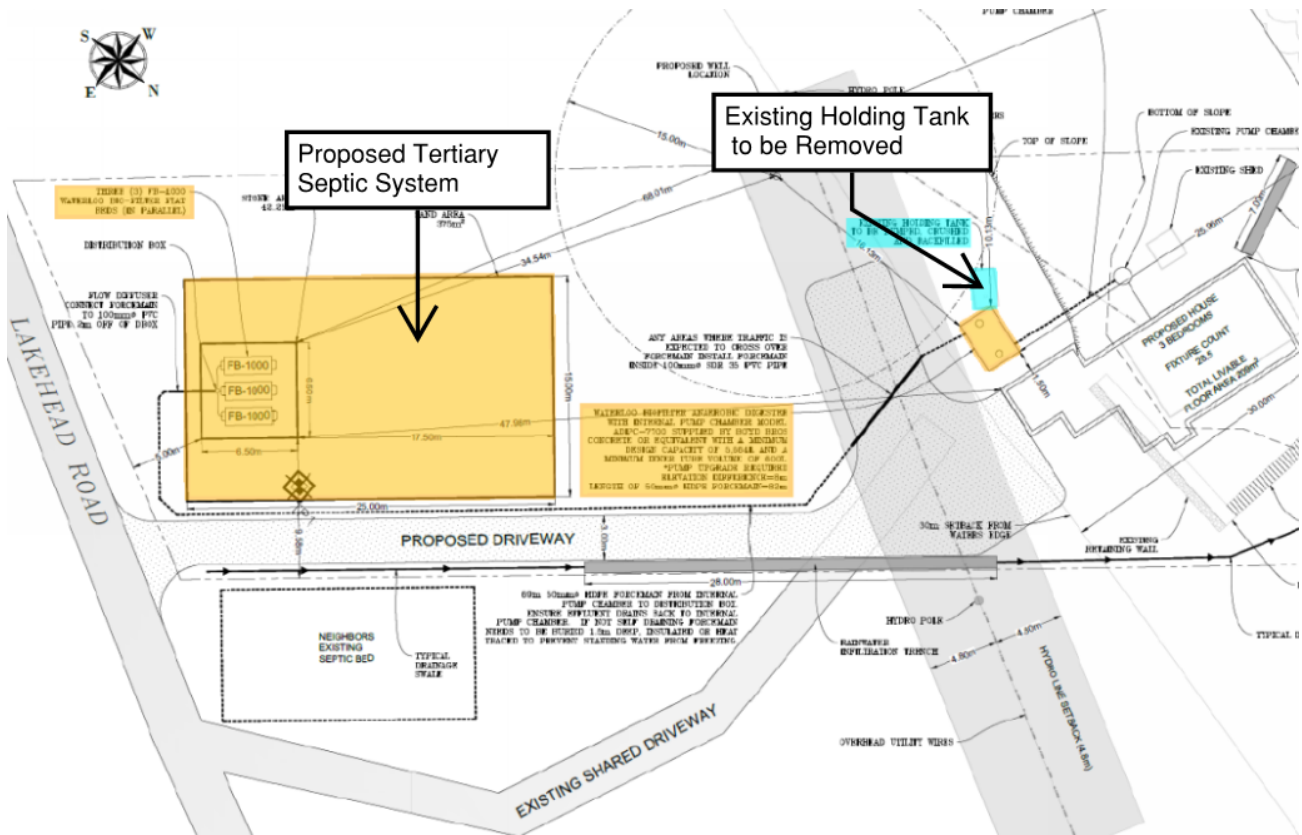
Location of Existing Holding Tank (Blue) and Proposed Tertiary Septic System (Orange)
